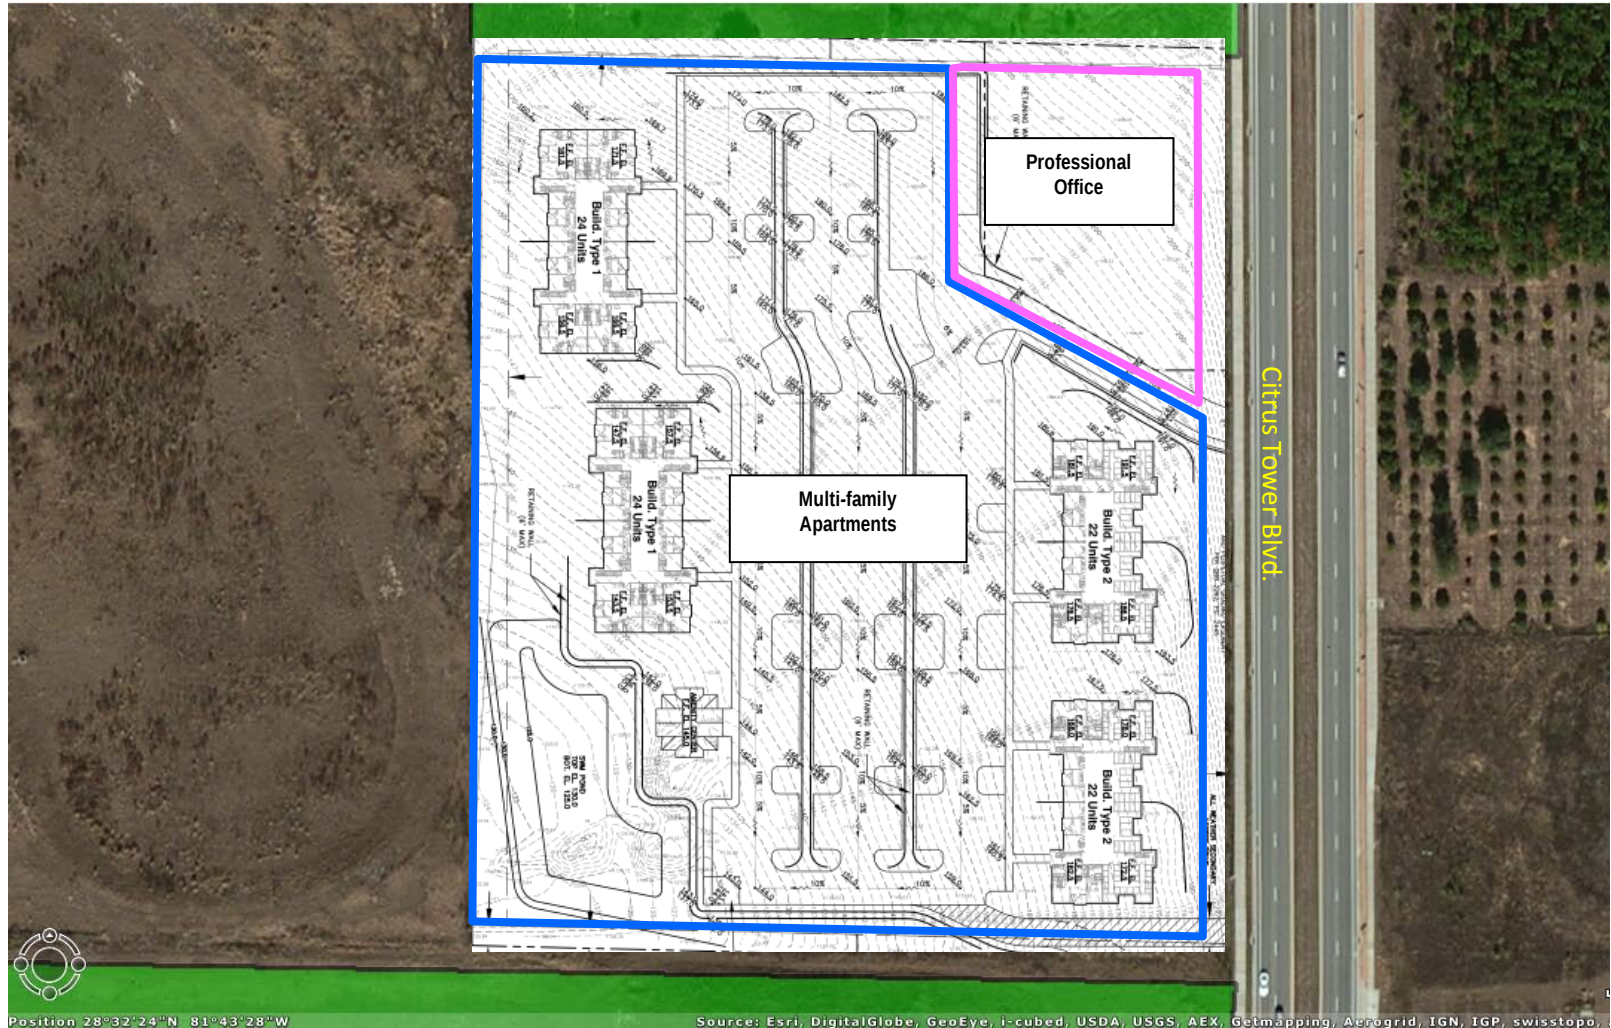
Proposed Site Layout – Visual Use Only Citrus Tower Apartments and Professional Office
